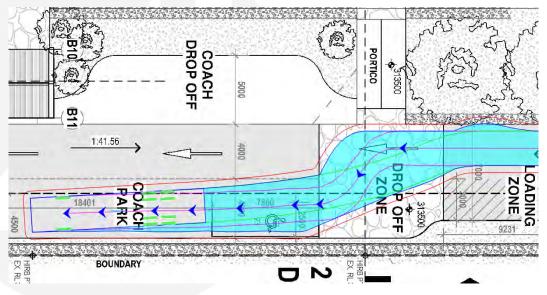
Coach Entering Parking Area Driving Through Mobility Parking Space
